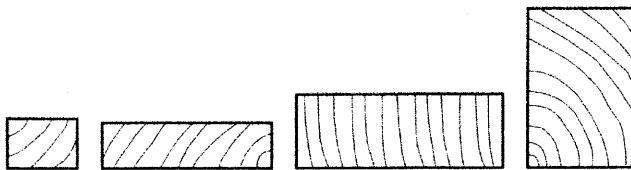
Cross Sections: lath, plank, board, squared timber (Basics Timber Construction)
